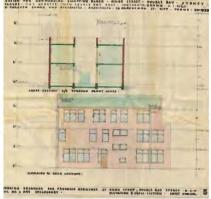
Evan's Knox Lane elevation and section of the proposed "shopping block" at No 21 Bay Street.
